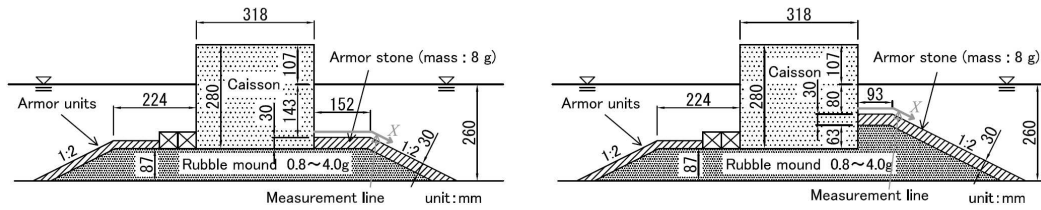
Cross-section of the tested breakwater. (Left) : Without widened protection. (Right) : With widened protection.
